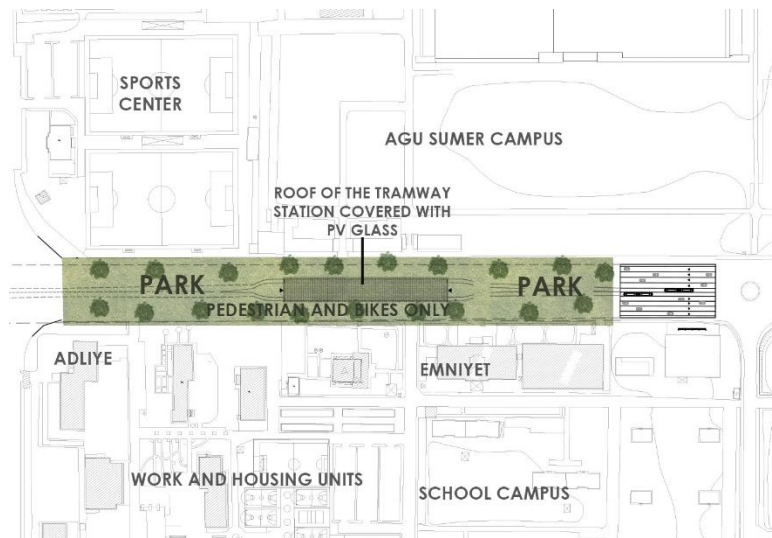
Site plan of a station design suggesting to move Erkilet Boulevard underground. (Berfin Nur Şahin)
